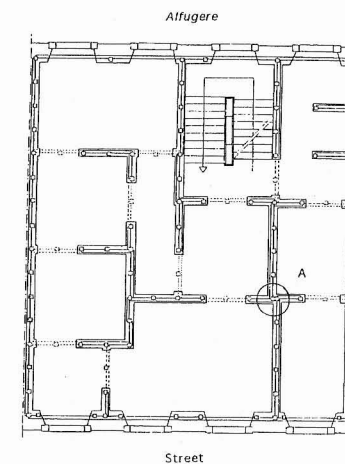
A variant of the module: Floor plan of no. 110 São Nicolau Street. (Drawing by Jorge Mascarenhas).
